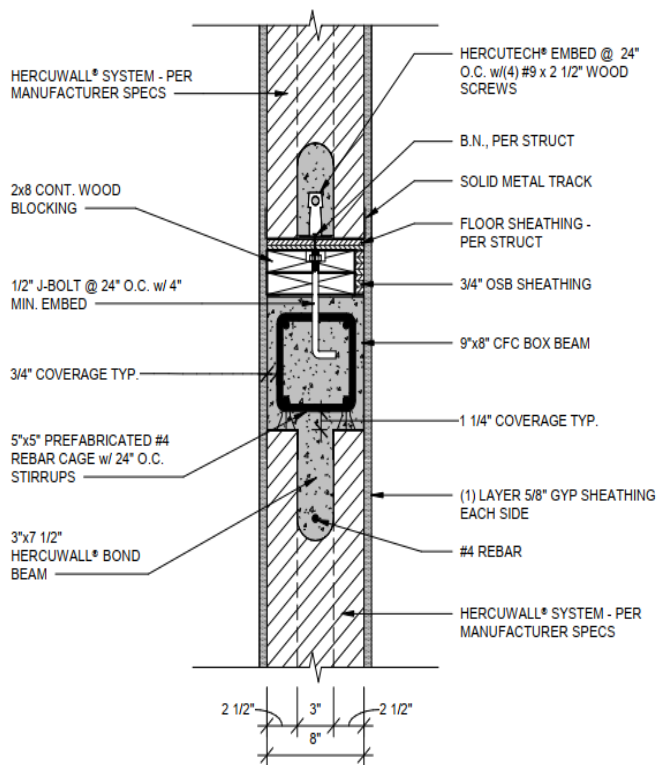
1-hr Load-Bearing Unbraced CFC Box Beam Wall
